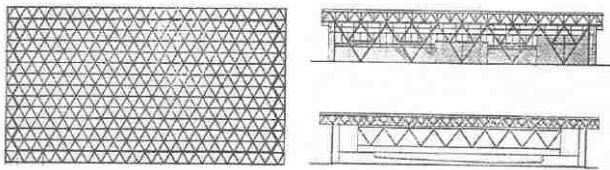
La Rochelle swimming pool, plan, section and elevation, Ref 1
